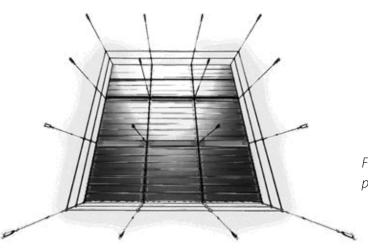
Top view of suspended platform showing possible position of gap decks
